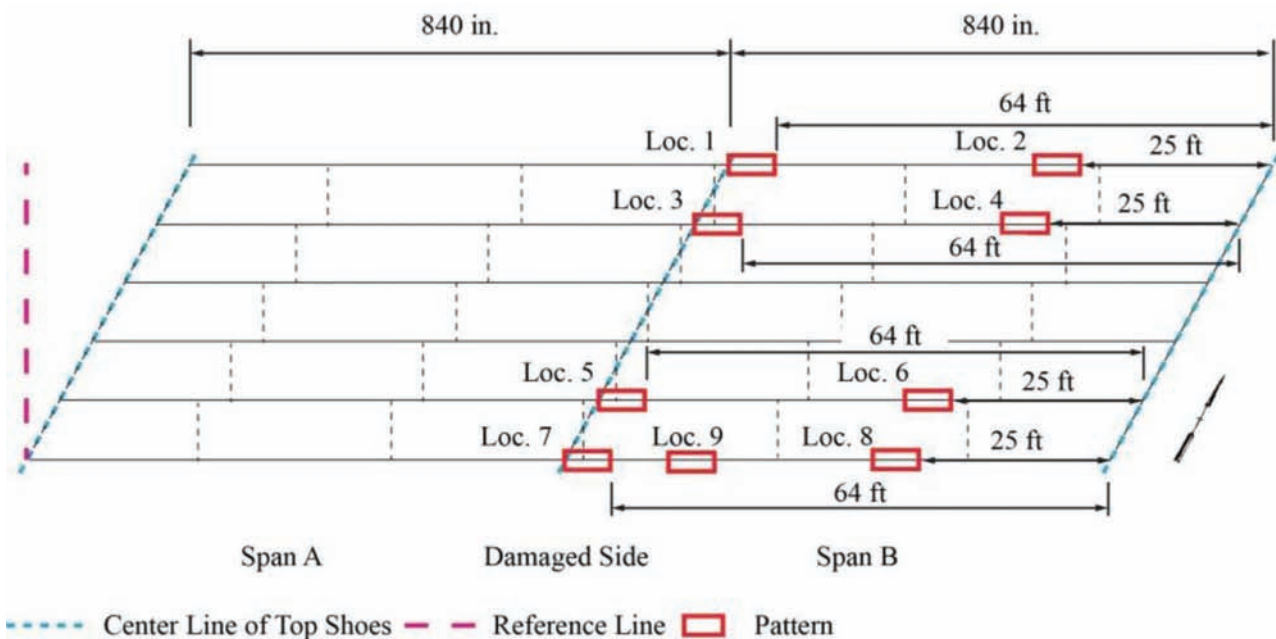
Framing plan and pattern locations for Asset 037-55-05265.
